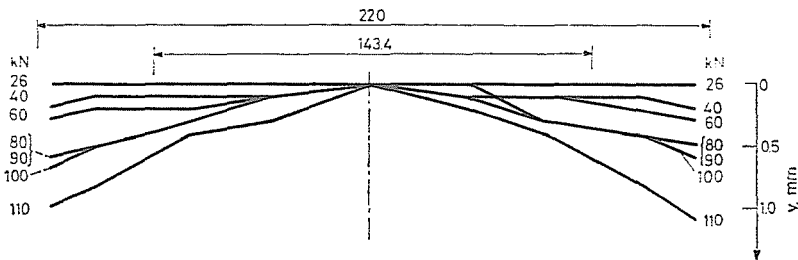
Deformations of the loaded cross section of the track slab at the different load steps, in case of half load
